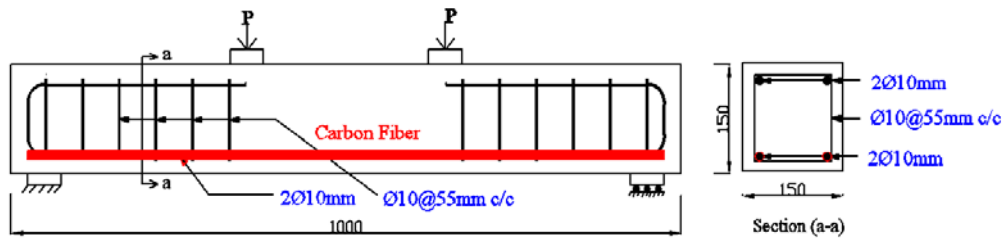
dimensions and details of the tested beams having reinforcing bars wrapped by CFRB at a length of (900mm)
